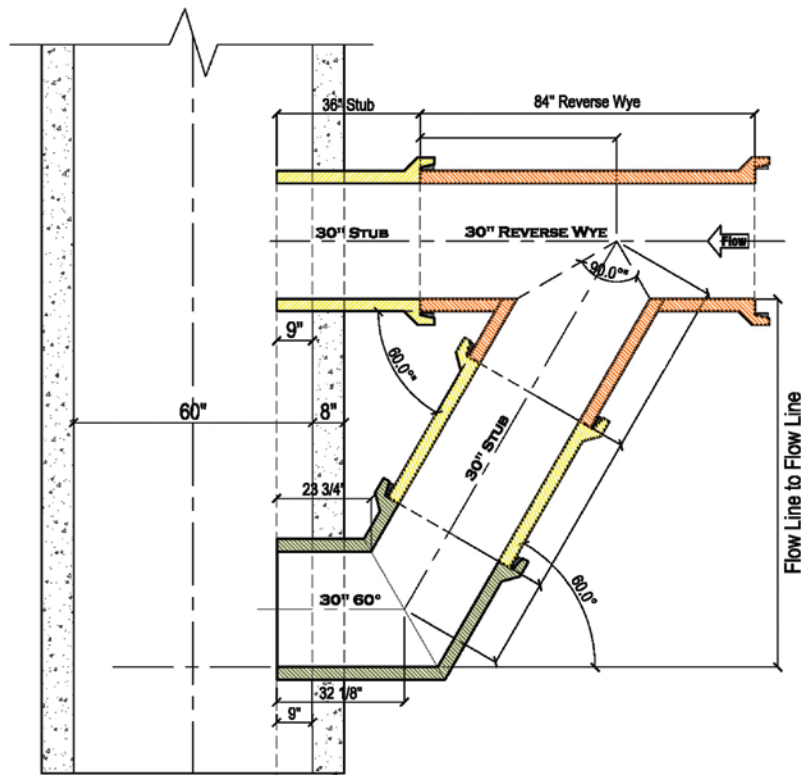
Drop Manhole Detail using a 30-inch VCP reverse wye fitting
